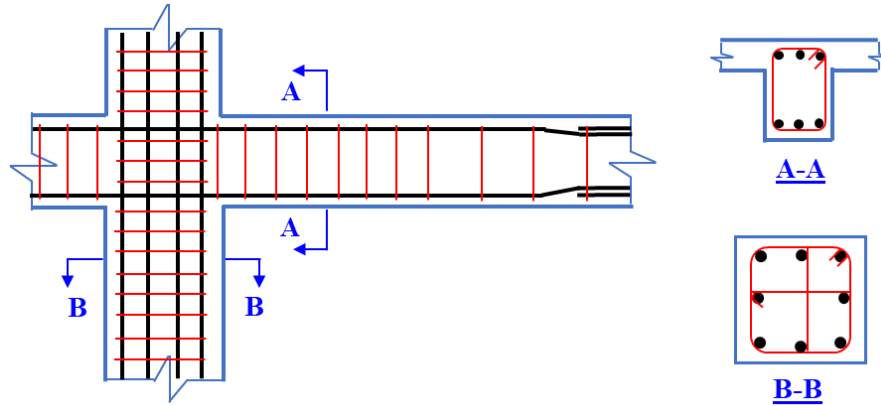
Typical reinforcement details required for ductile flexural behaviour
